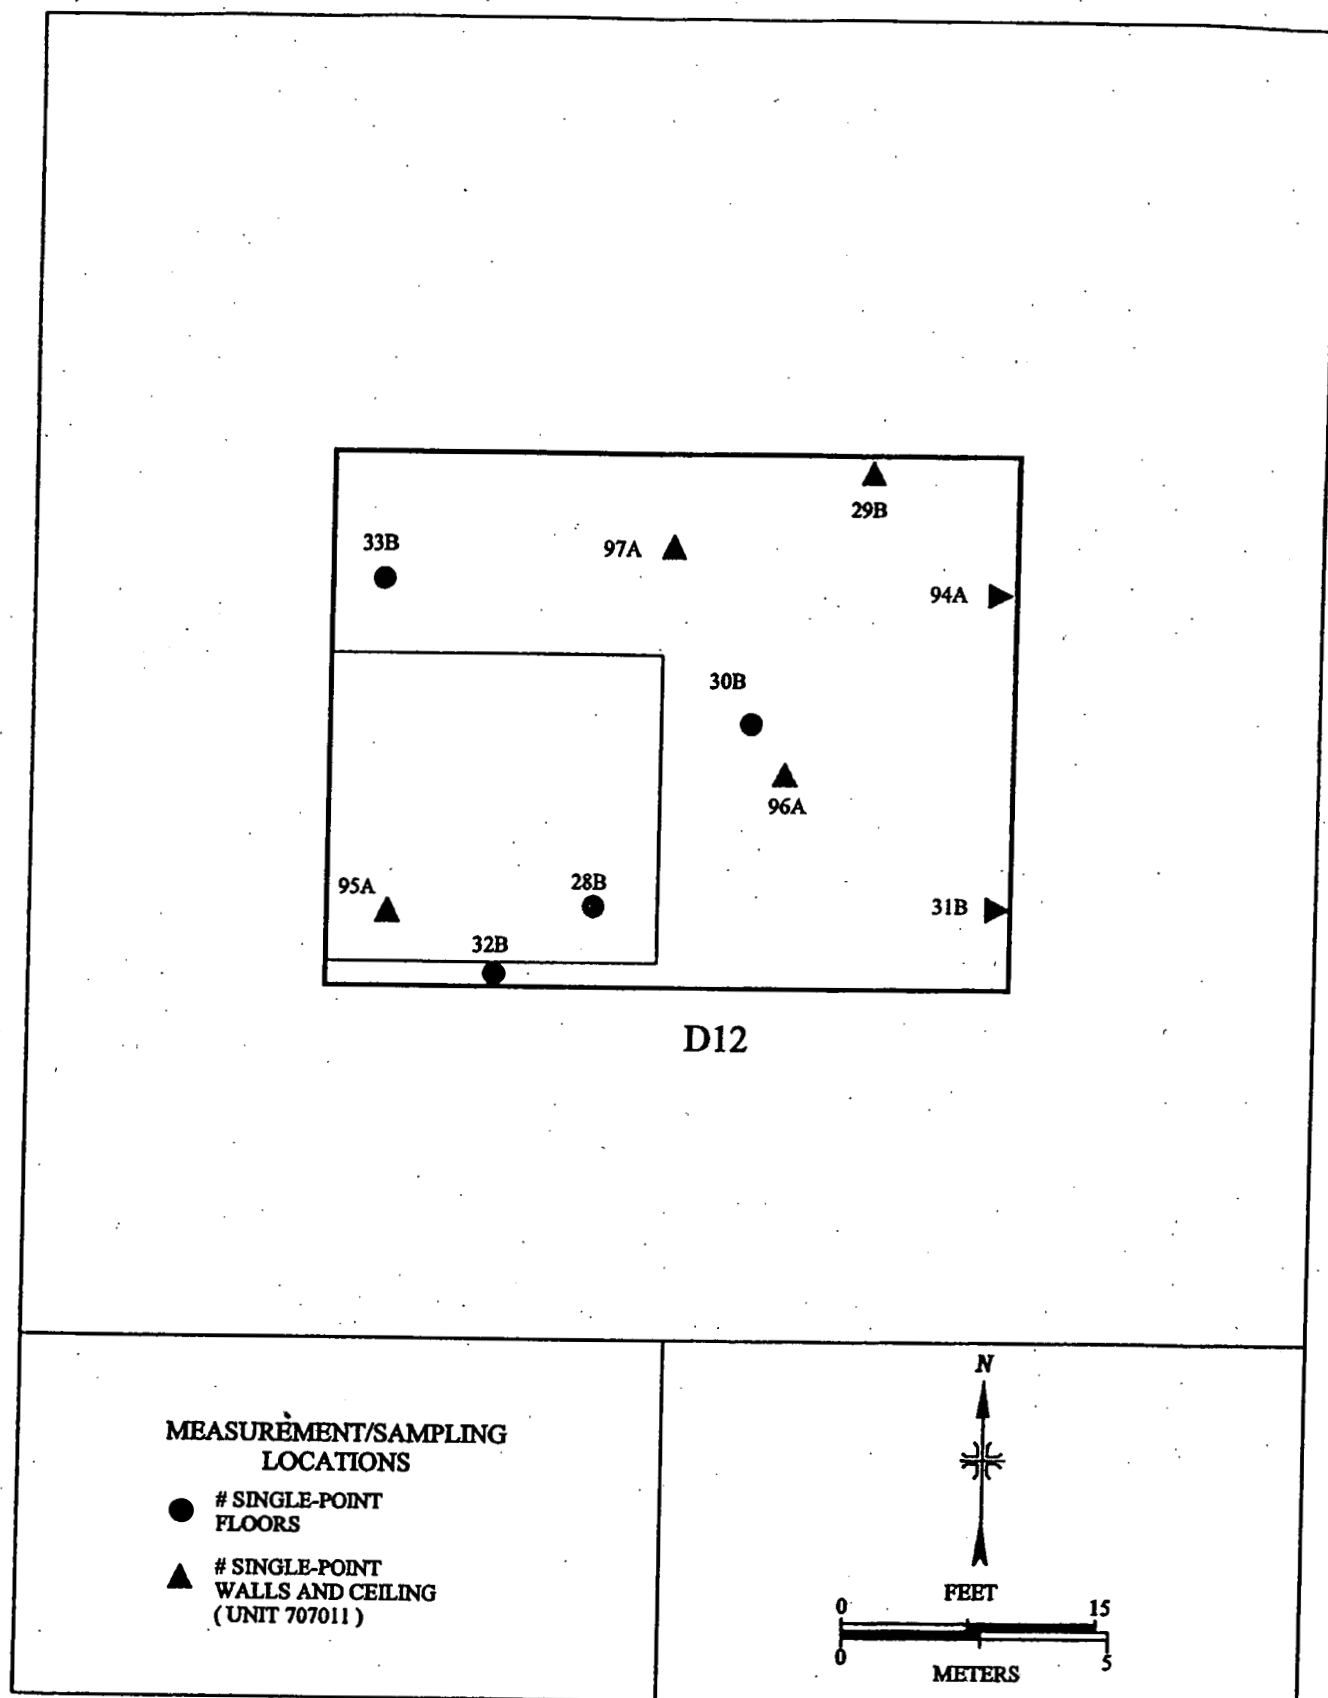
Building 707, Second Floor, Survey Units 707011 and 707101 - Measurement and Sampling Locations
